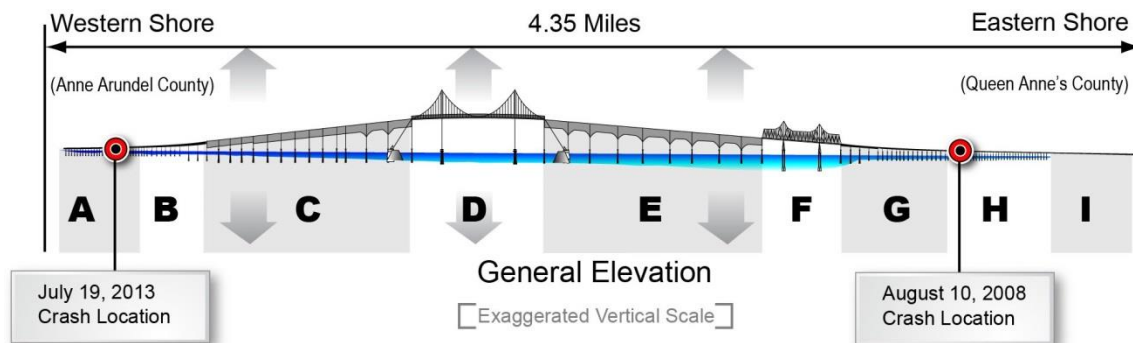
General elevation diagram of Chesapeake Bay Bridge eastbound span, noting locations of July 19, 2013, and August 10, 2008, crashes. Sections A and H are both beam span construction. Other construction types within the eastbound span include girder spans, deck truss spans, suspension spans, deck cantilever truss spans, and through cantilever truss spans.
